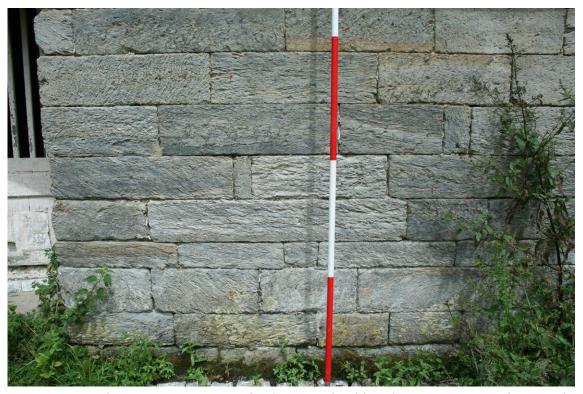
North-east Range – very finely jointed ashlar slate masonry on farmyard elevation.
